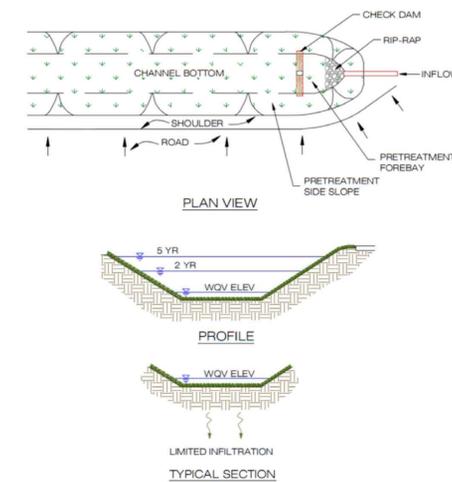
Grass Channel - Typical Plan, Profile and Section
